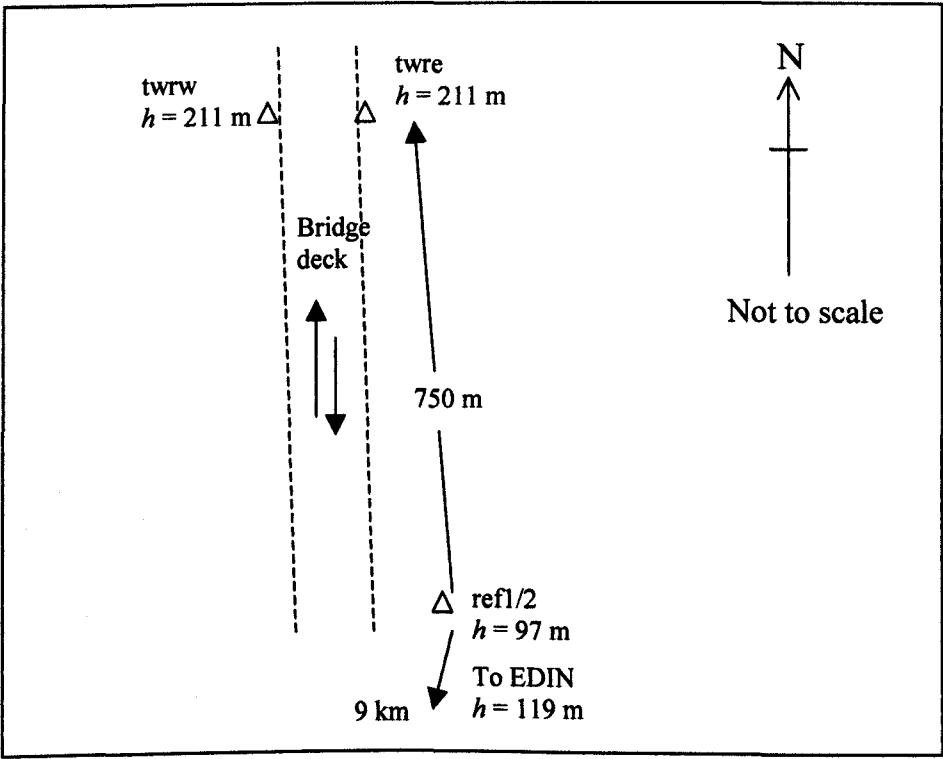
Location of stations for the Forth Road Bridge Trial.
